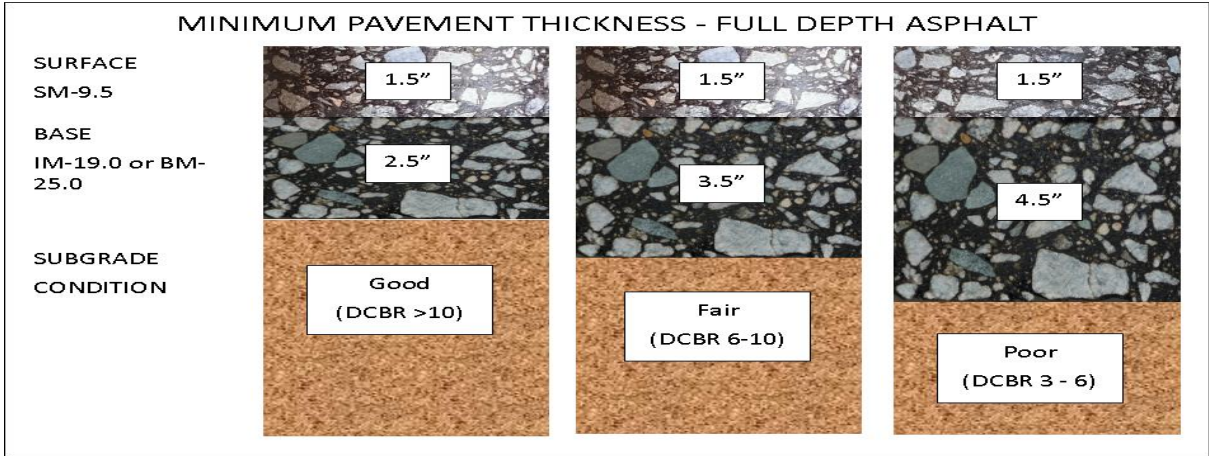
Full-Depth Asphalt Pavement (Parking Stall Areas)
